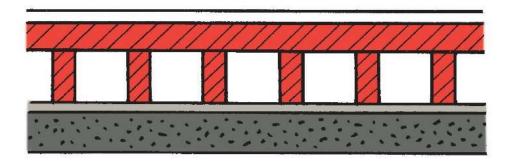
RCC slab + 75mm brick laid at intervals of 230mm c/c+ brick tile covering + 20mm cement mortar finish. ACC (Autoclaved Aerated Concrete) Blocks can be used instead of bricks
